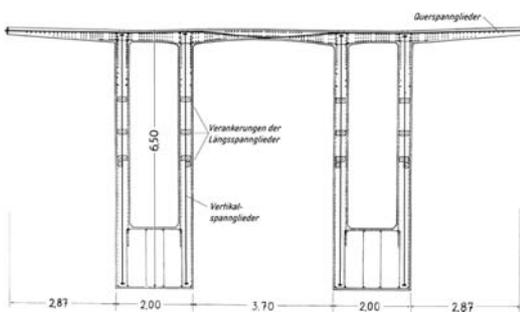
cross section of Finsterwalder's longitudinal and transverse prestressing
